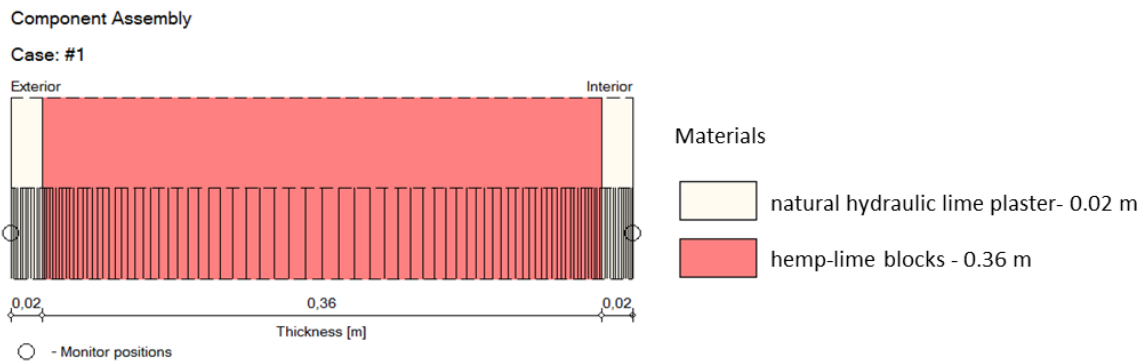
Numerical model of the wall transversal section (WUFI® Pro 6.3)
